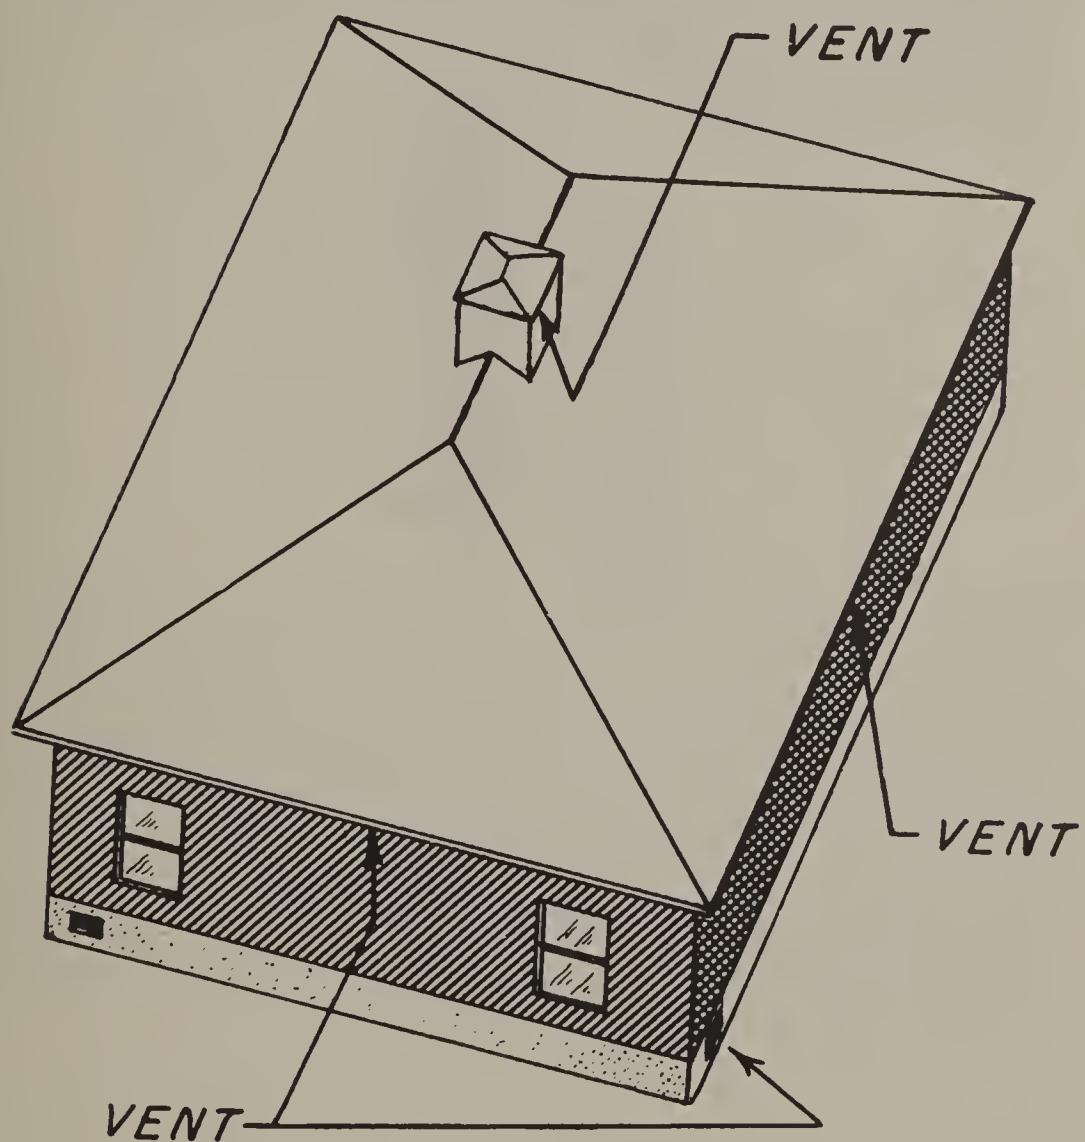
Special roof vent for hip roof.* This type of vent in conjunction with eave vents is arranged to provide another means of condensation control. This vent is located on the ridge of the building and supplemented by vents in the eaves. Its construction is similar to that shown in figure 43 and its net area can be obtained from "Good Practice Recommendations." The location of crawl space vents near the corners of the building is shown.
